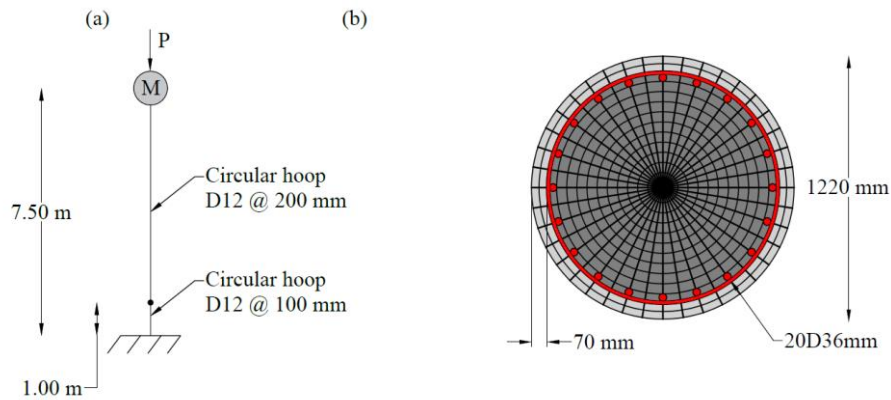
(a) Geometric dimensions, transverse reinforcement, and identification of two-beam elements of the bridge pier, (b) cross-section discretisation.
